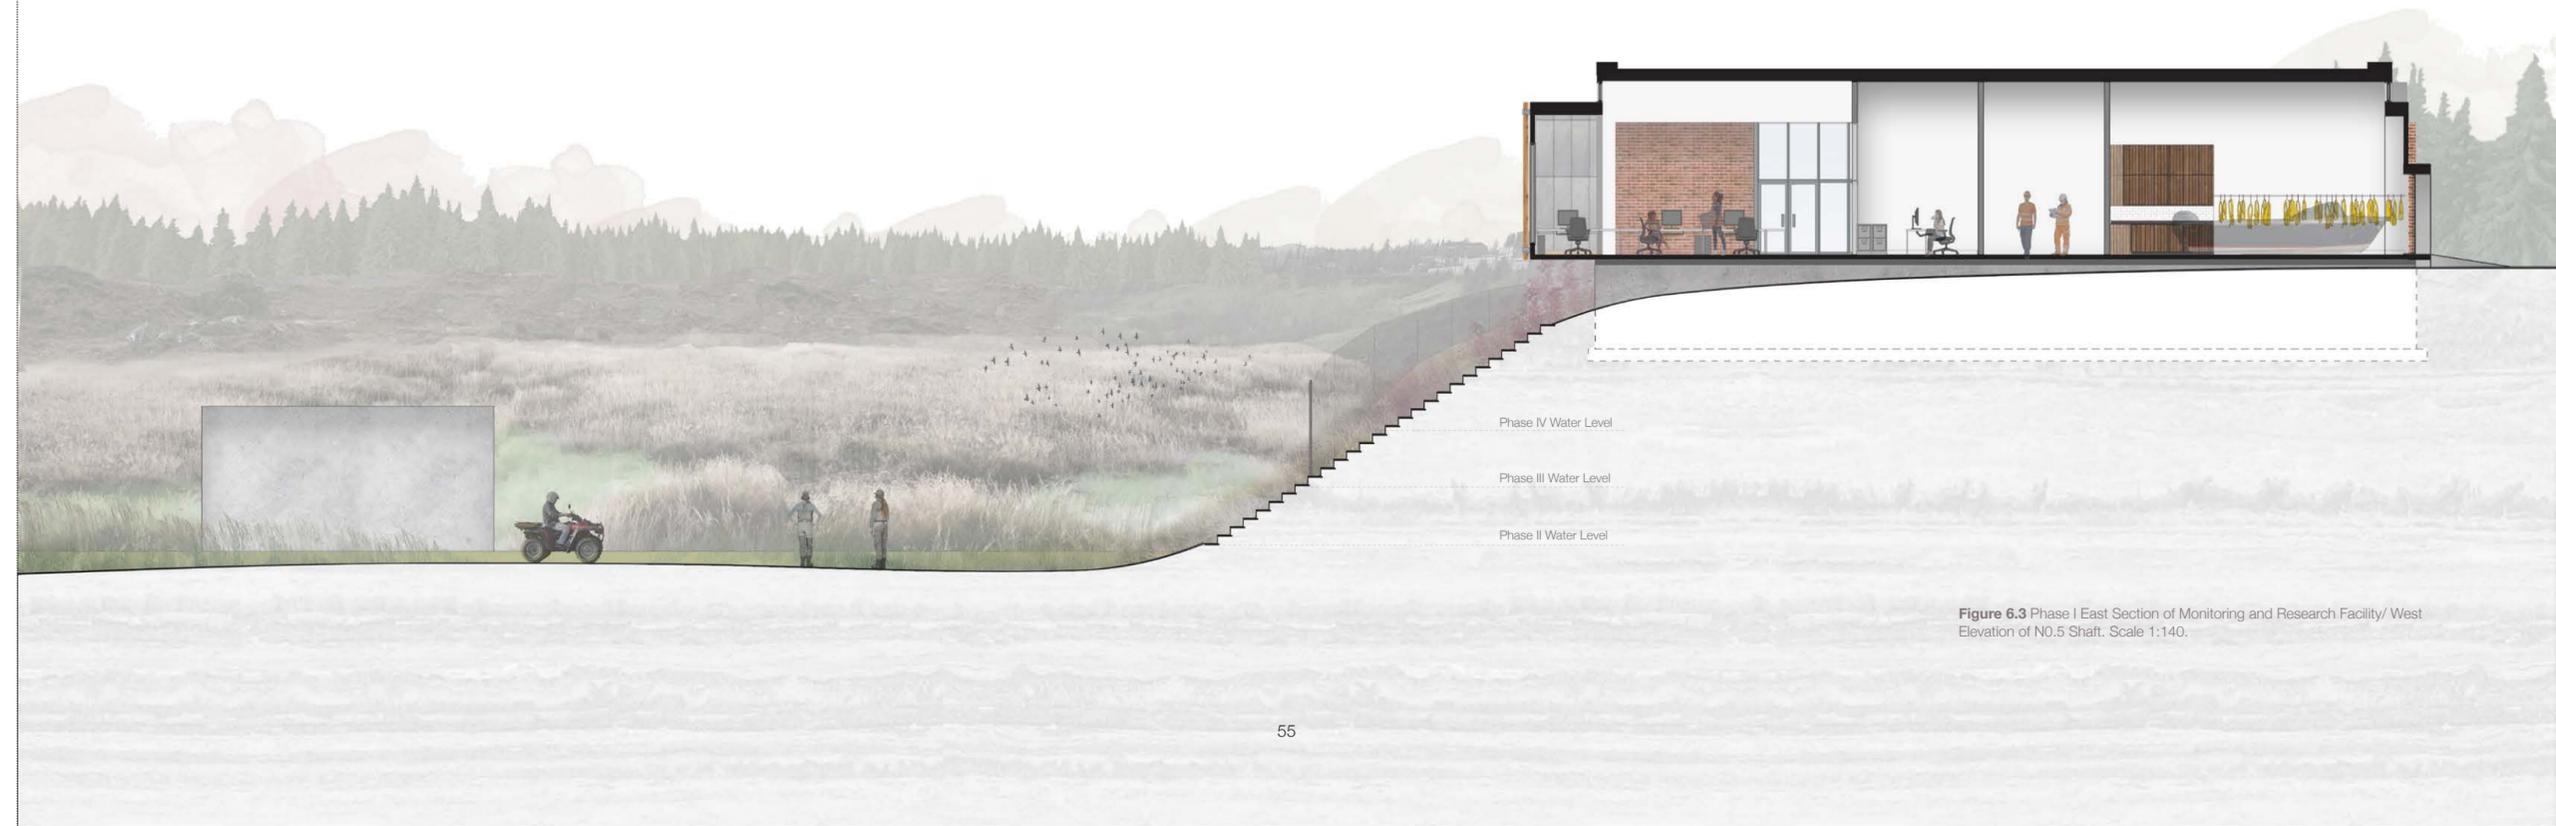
Phase I East Section of Monitoring and Research Facility/ West Elevation of N0.5 Shaft. Scale 1:140.
